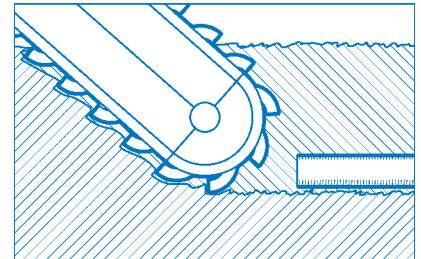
Since excavated soil is used as backfill material in the milling method it is recommended that pipe systems with integrated protective layers be used.
